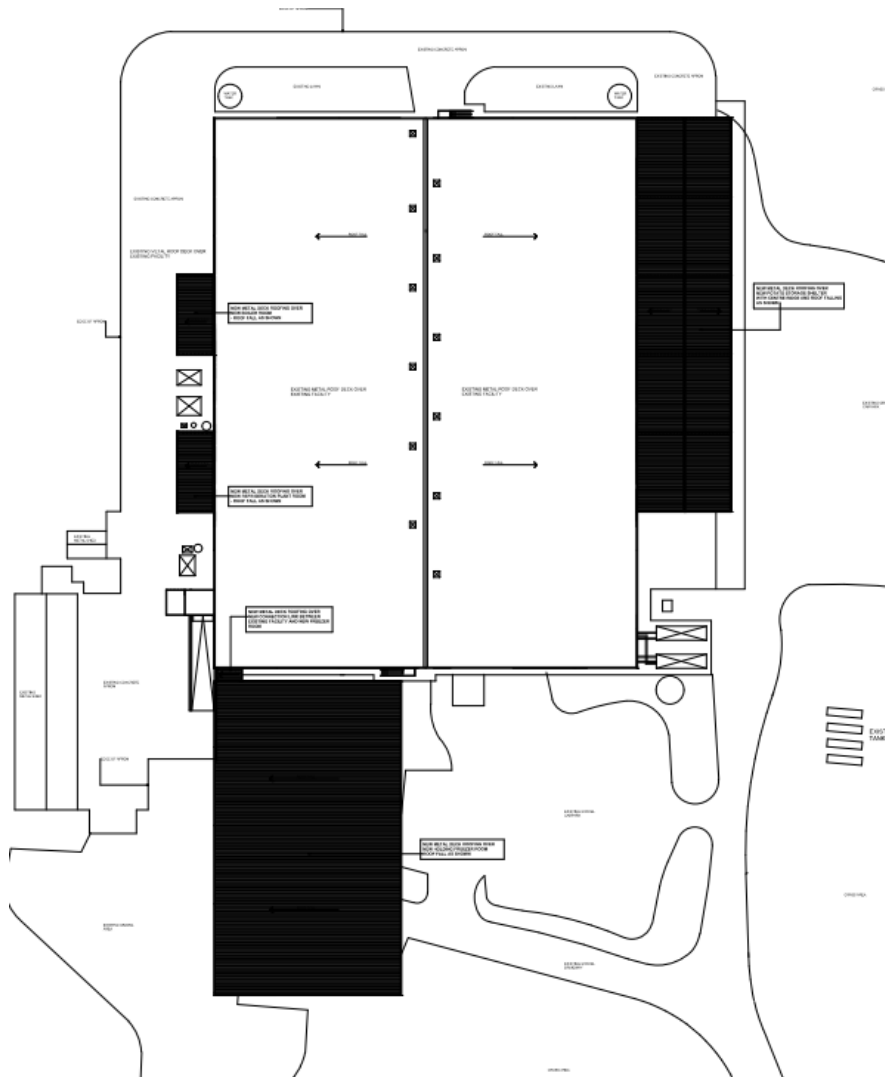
The roof plan showing proposed extensions to the existing shed in black.
